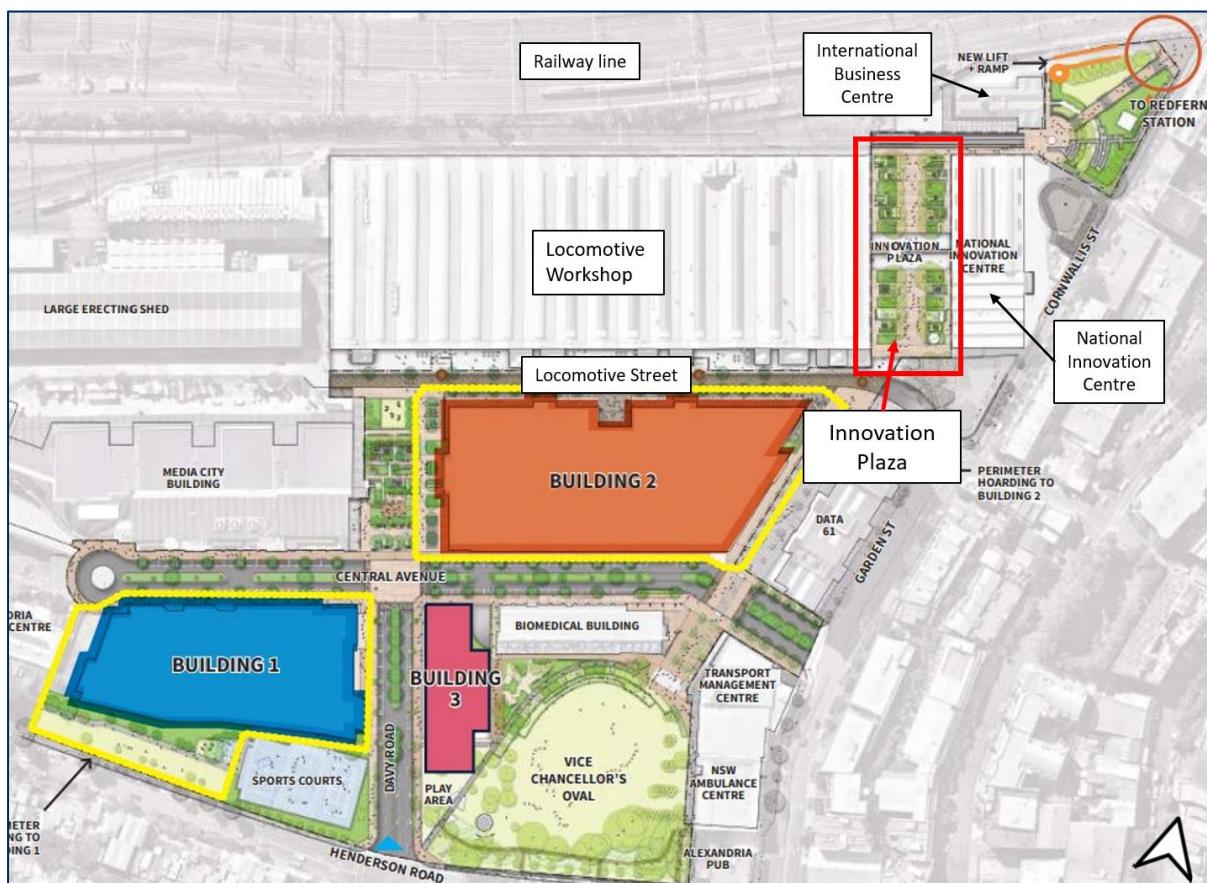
| South Eveleigh Precinct and location of Innovation Plaza (Source: Mirvac)
